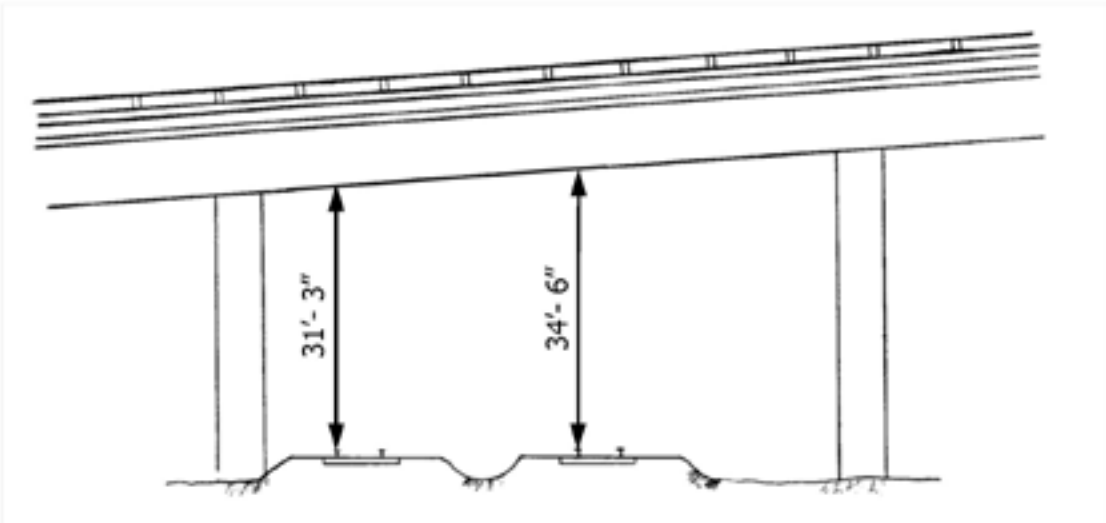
Bridge elevation view with an electrified passenger rail track and a non-electrified passenger rail track below the bridge.
